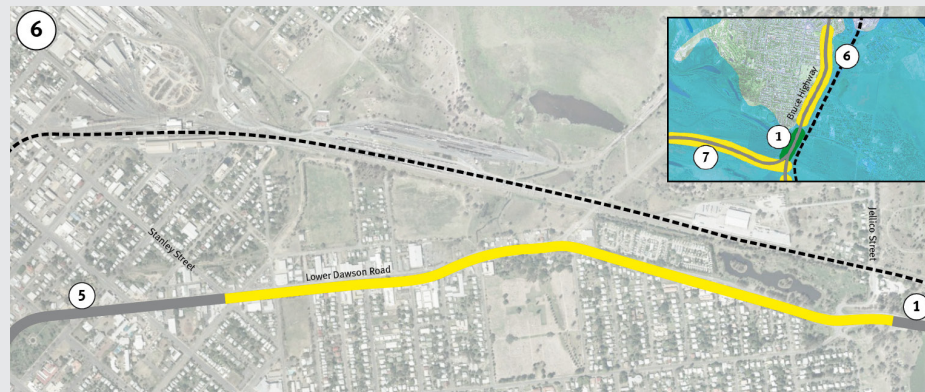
Stage 6, Jellico Street to Stanley Street
